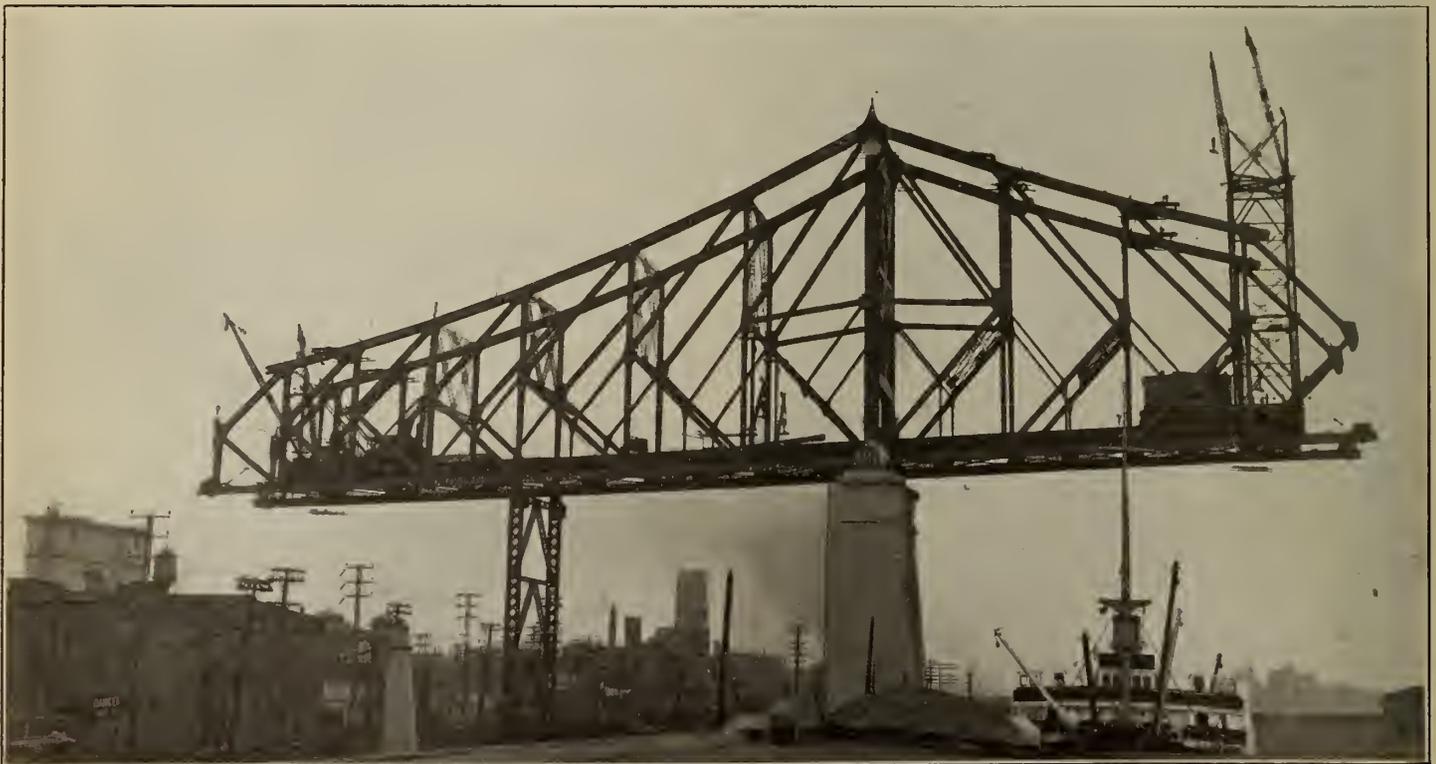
Main Span, North Side—Further concurrent Erection Progress on Anchor and Cantilever Arms.
